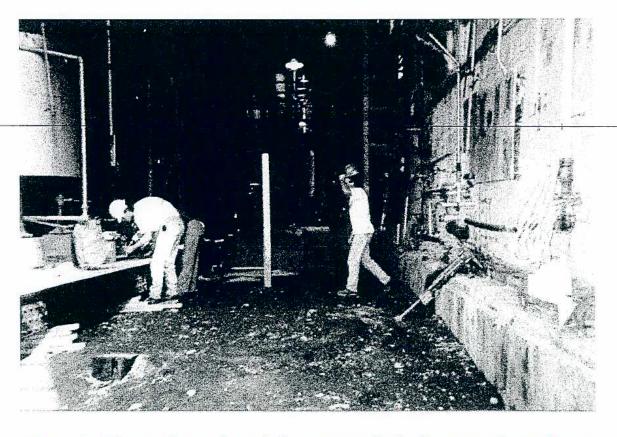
View to East of partially cemented pit, floor trench, and new sump well.
